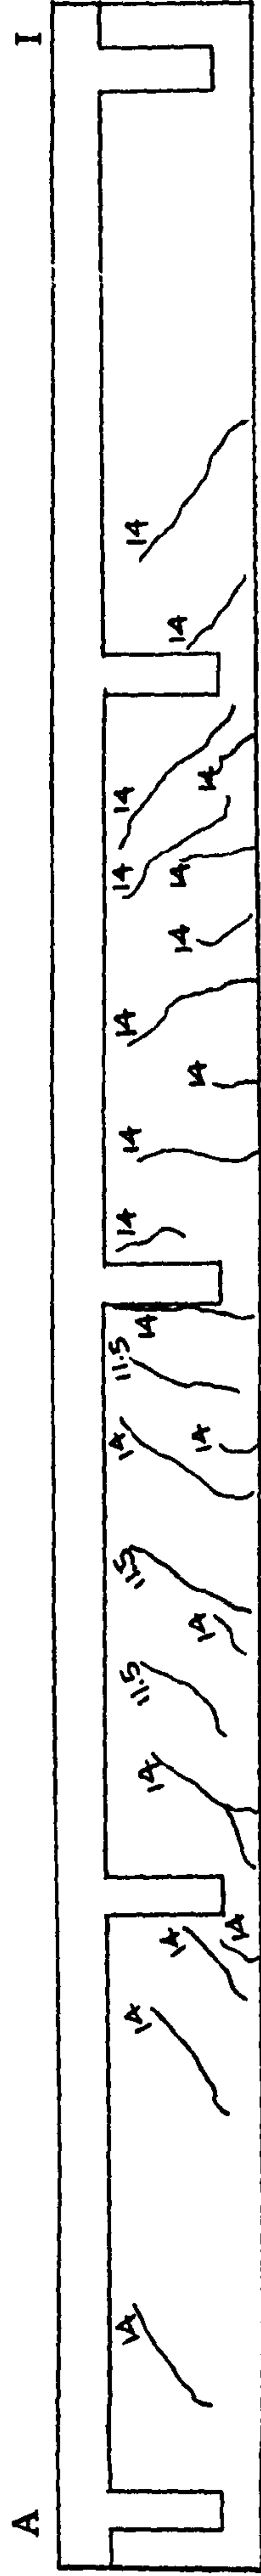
(c)-Crack Pattern on the Sides of Beam #3 of the Model Bridge Deck
